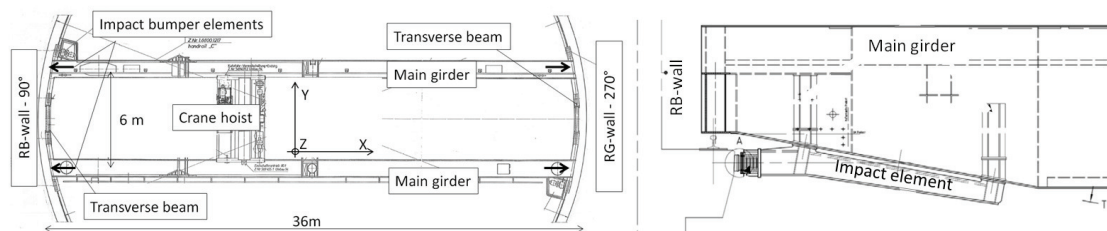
Layout and view of the polar crane support, BKW Energie AG.
